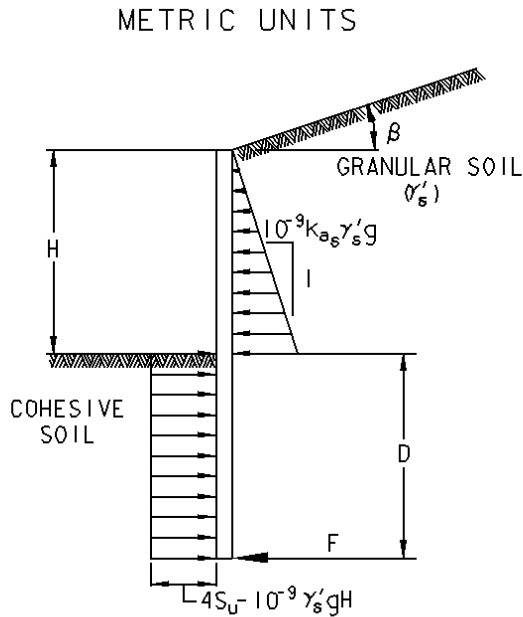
Simplified Earth Pressure Distributions for Temporary Nongravity Cantilevered Walls with Discrete Vertical Wall Elements
